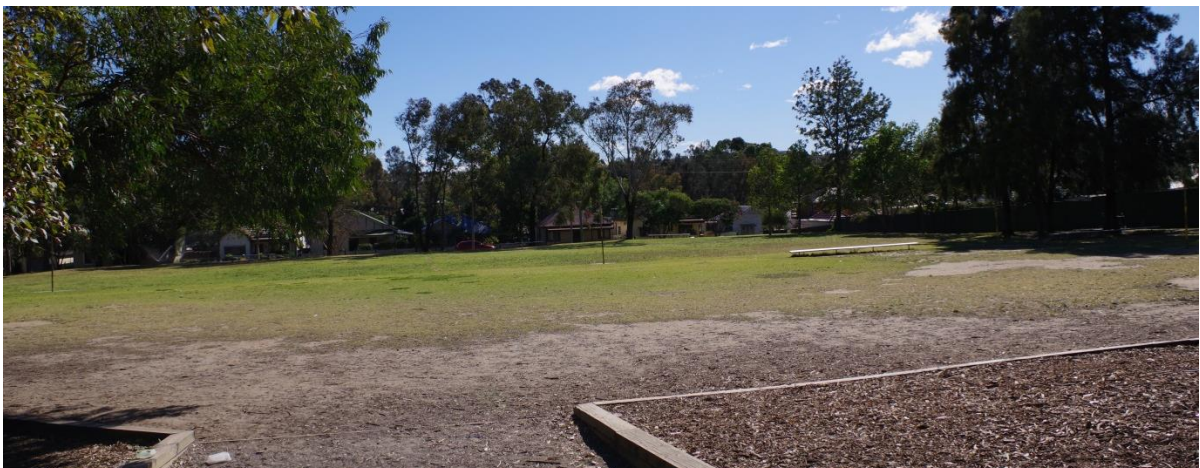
A general view into the proposed site of new building looking north from Railway Street with mature trees on the edges of the playground. (Source: Conrad Gargett)
